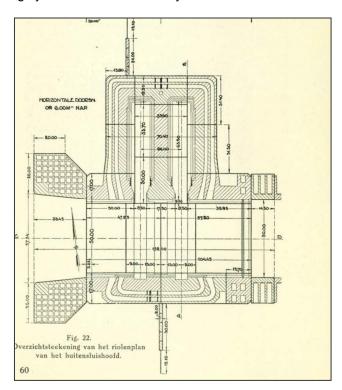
North Lock Outer Head: Horizontal Section of Short Culverts
